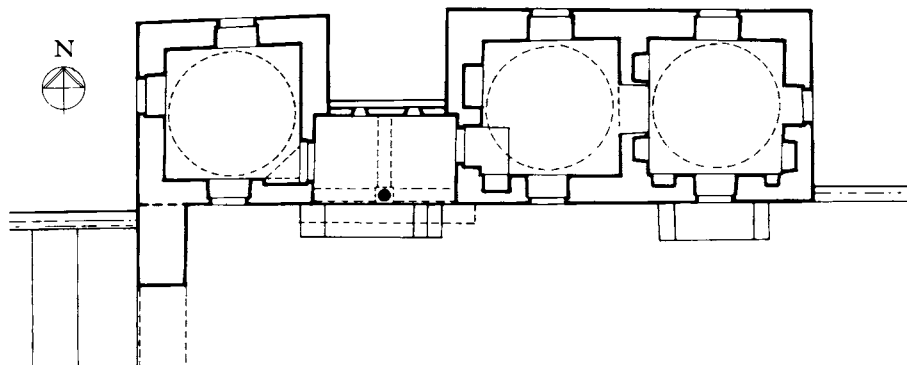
Khalwat Qitas and Khalwat Parwiz, ground-floor plan.
